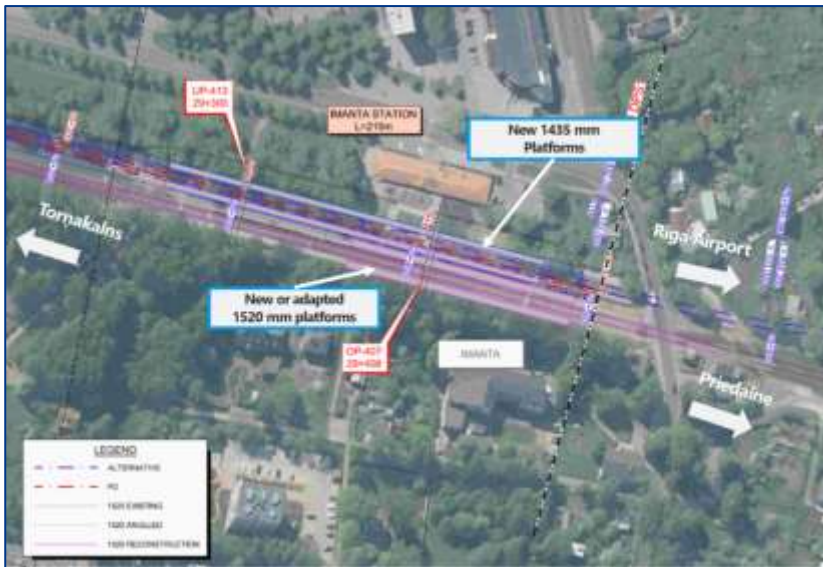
IMANTA STATION – PLANNED SITUATION⁵⁰
